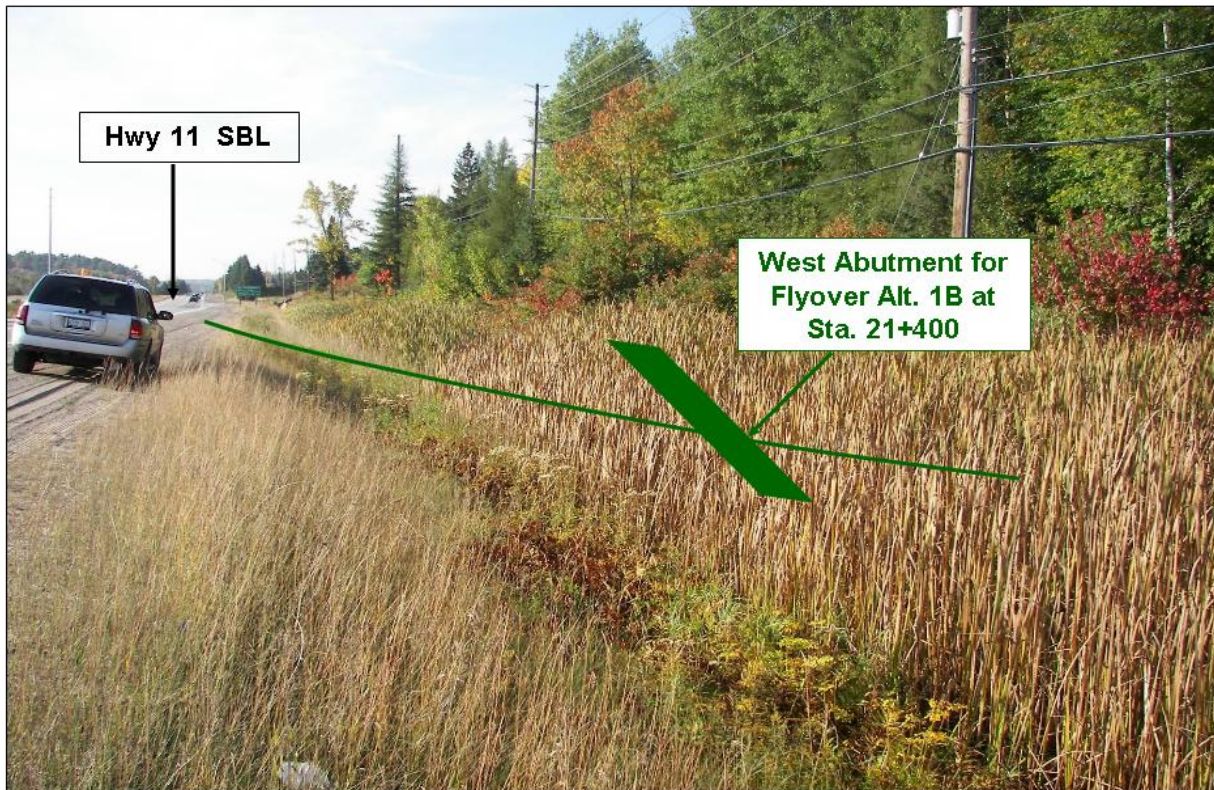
VIEW: Looking northwesterly from south shoulder of Rowanwood Road about 30m east of Highway 11 NBL. (Sept. 26, 2008)
